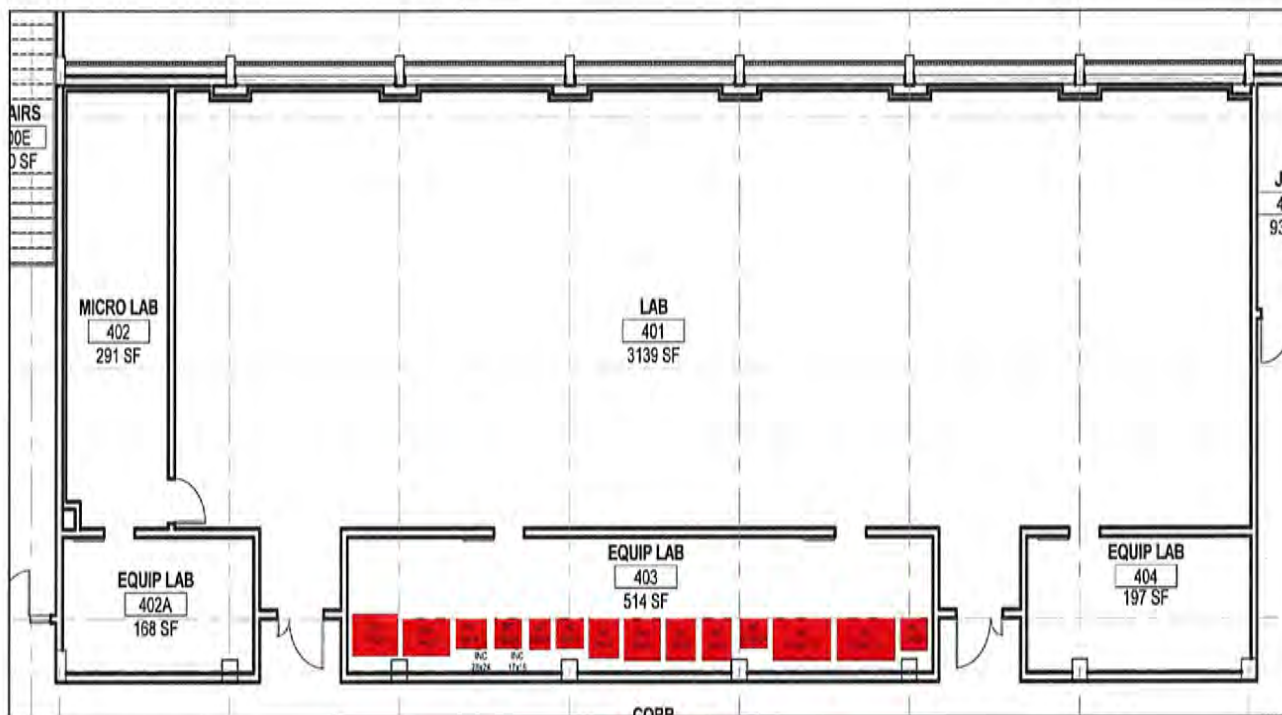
Floor plan (part A) for the UHM laboratory facilities described in this application.
